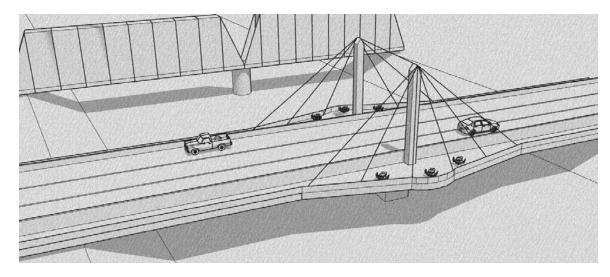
conceptual design for Main Street Bridge. Current bridge will be expanded for pedestrian lanes..
